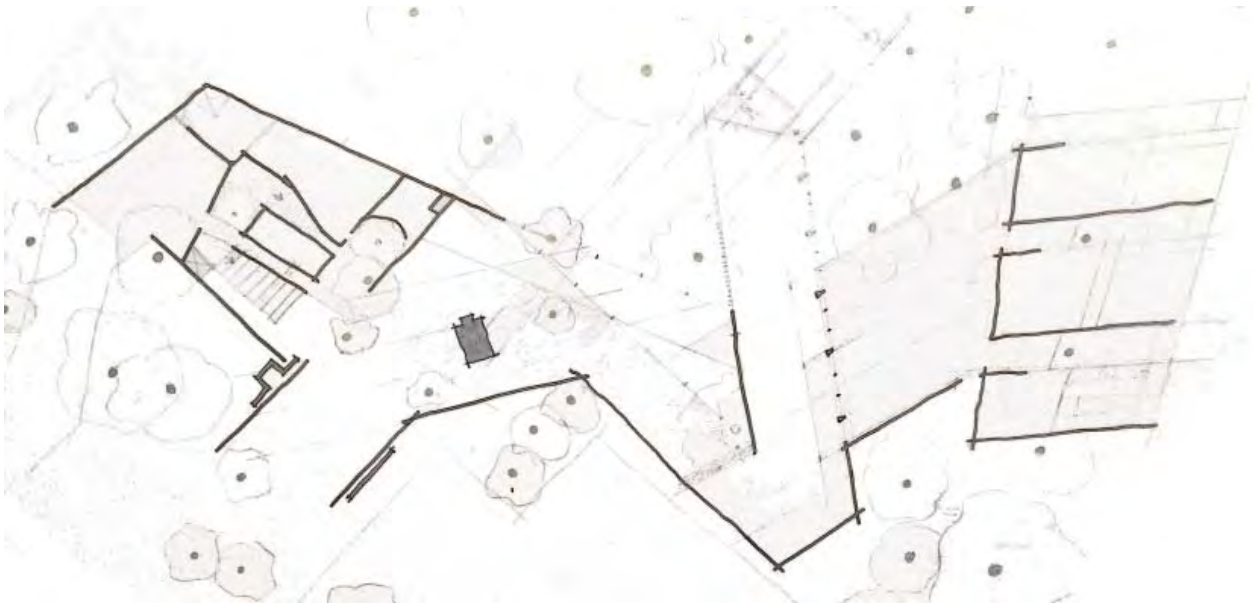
Cremation Relationship To Adjacent Buildings (Author)
